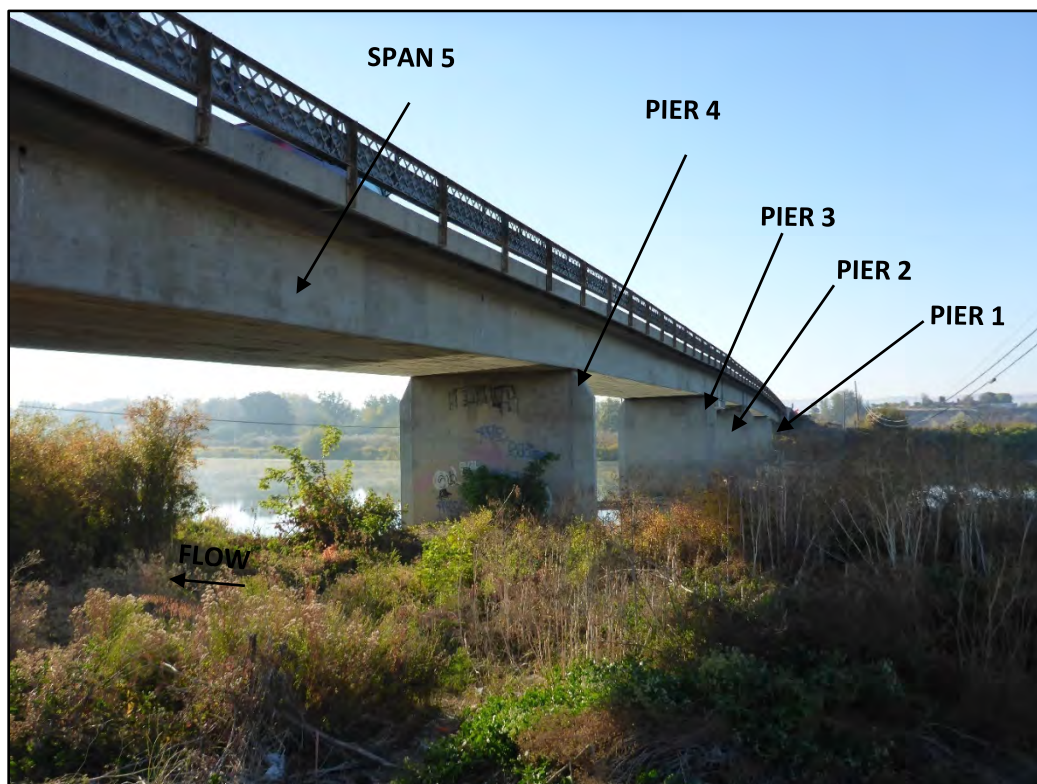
Pier 4 and Span 5 of Bridge 241/5 from the Left Bank of Yakima River
